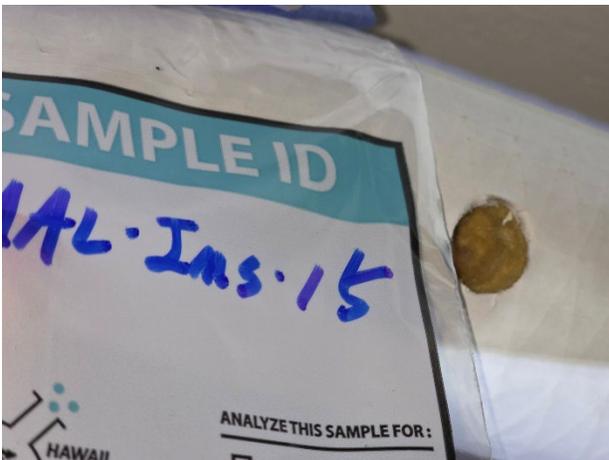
Sample ID: MAL-Ins-15 White wrap and yellow insulation. Above Drop Ceiling. Bathroom.
